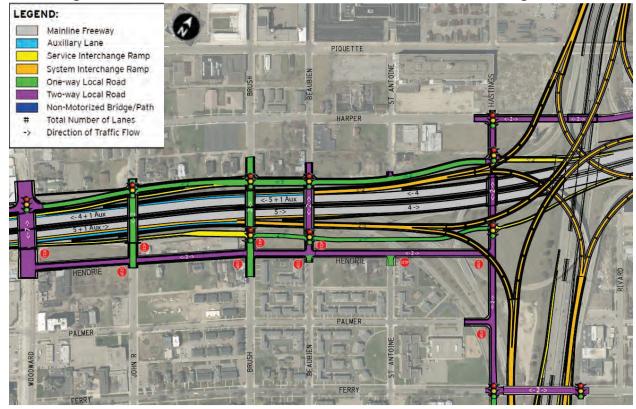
John R Street, Brush Street, Beaubien Street, and Hastings Street
